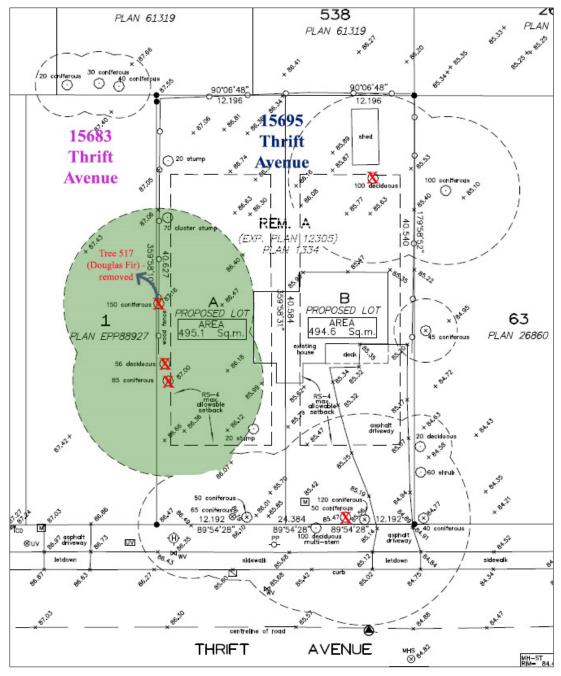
Proposed Subdivision Plan (15695 Thrift Avenue)
